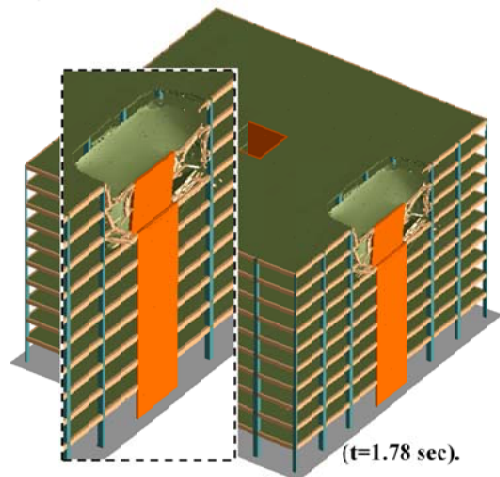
Partial collapse of edge shear wall removal from the 8th floor
